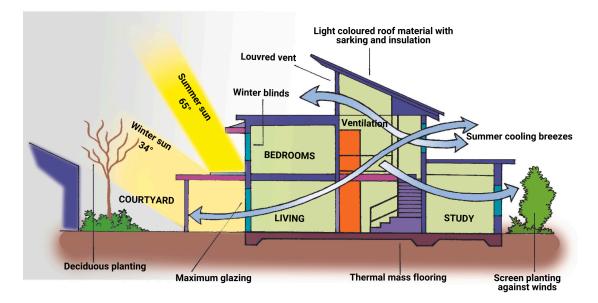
Building orientation and heat flow into the building | Source: Inhabitat
